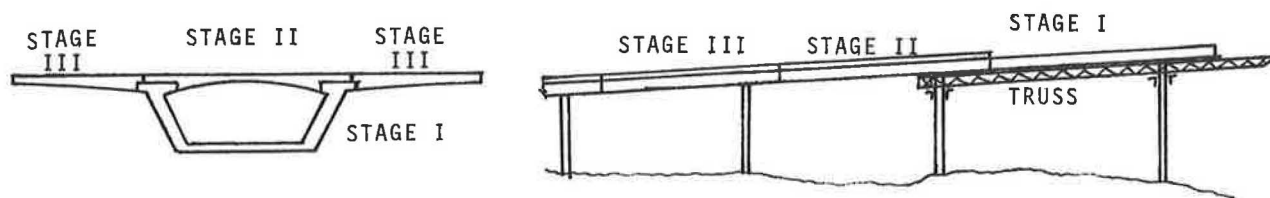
& 21 Denny Creek Bridge - Stage Construction
